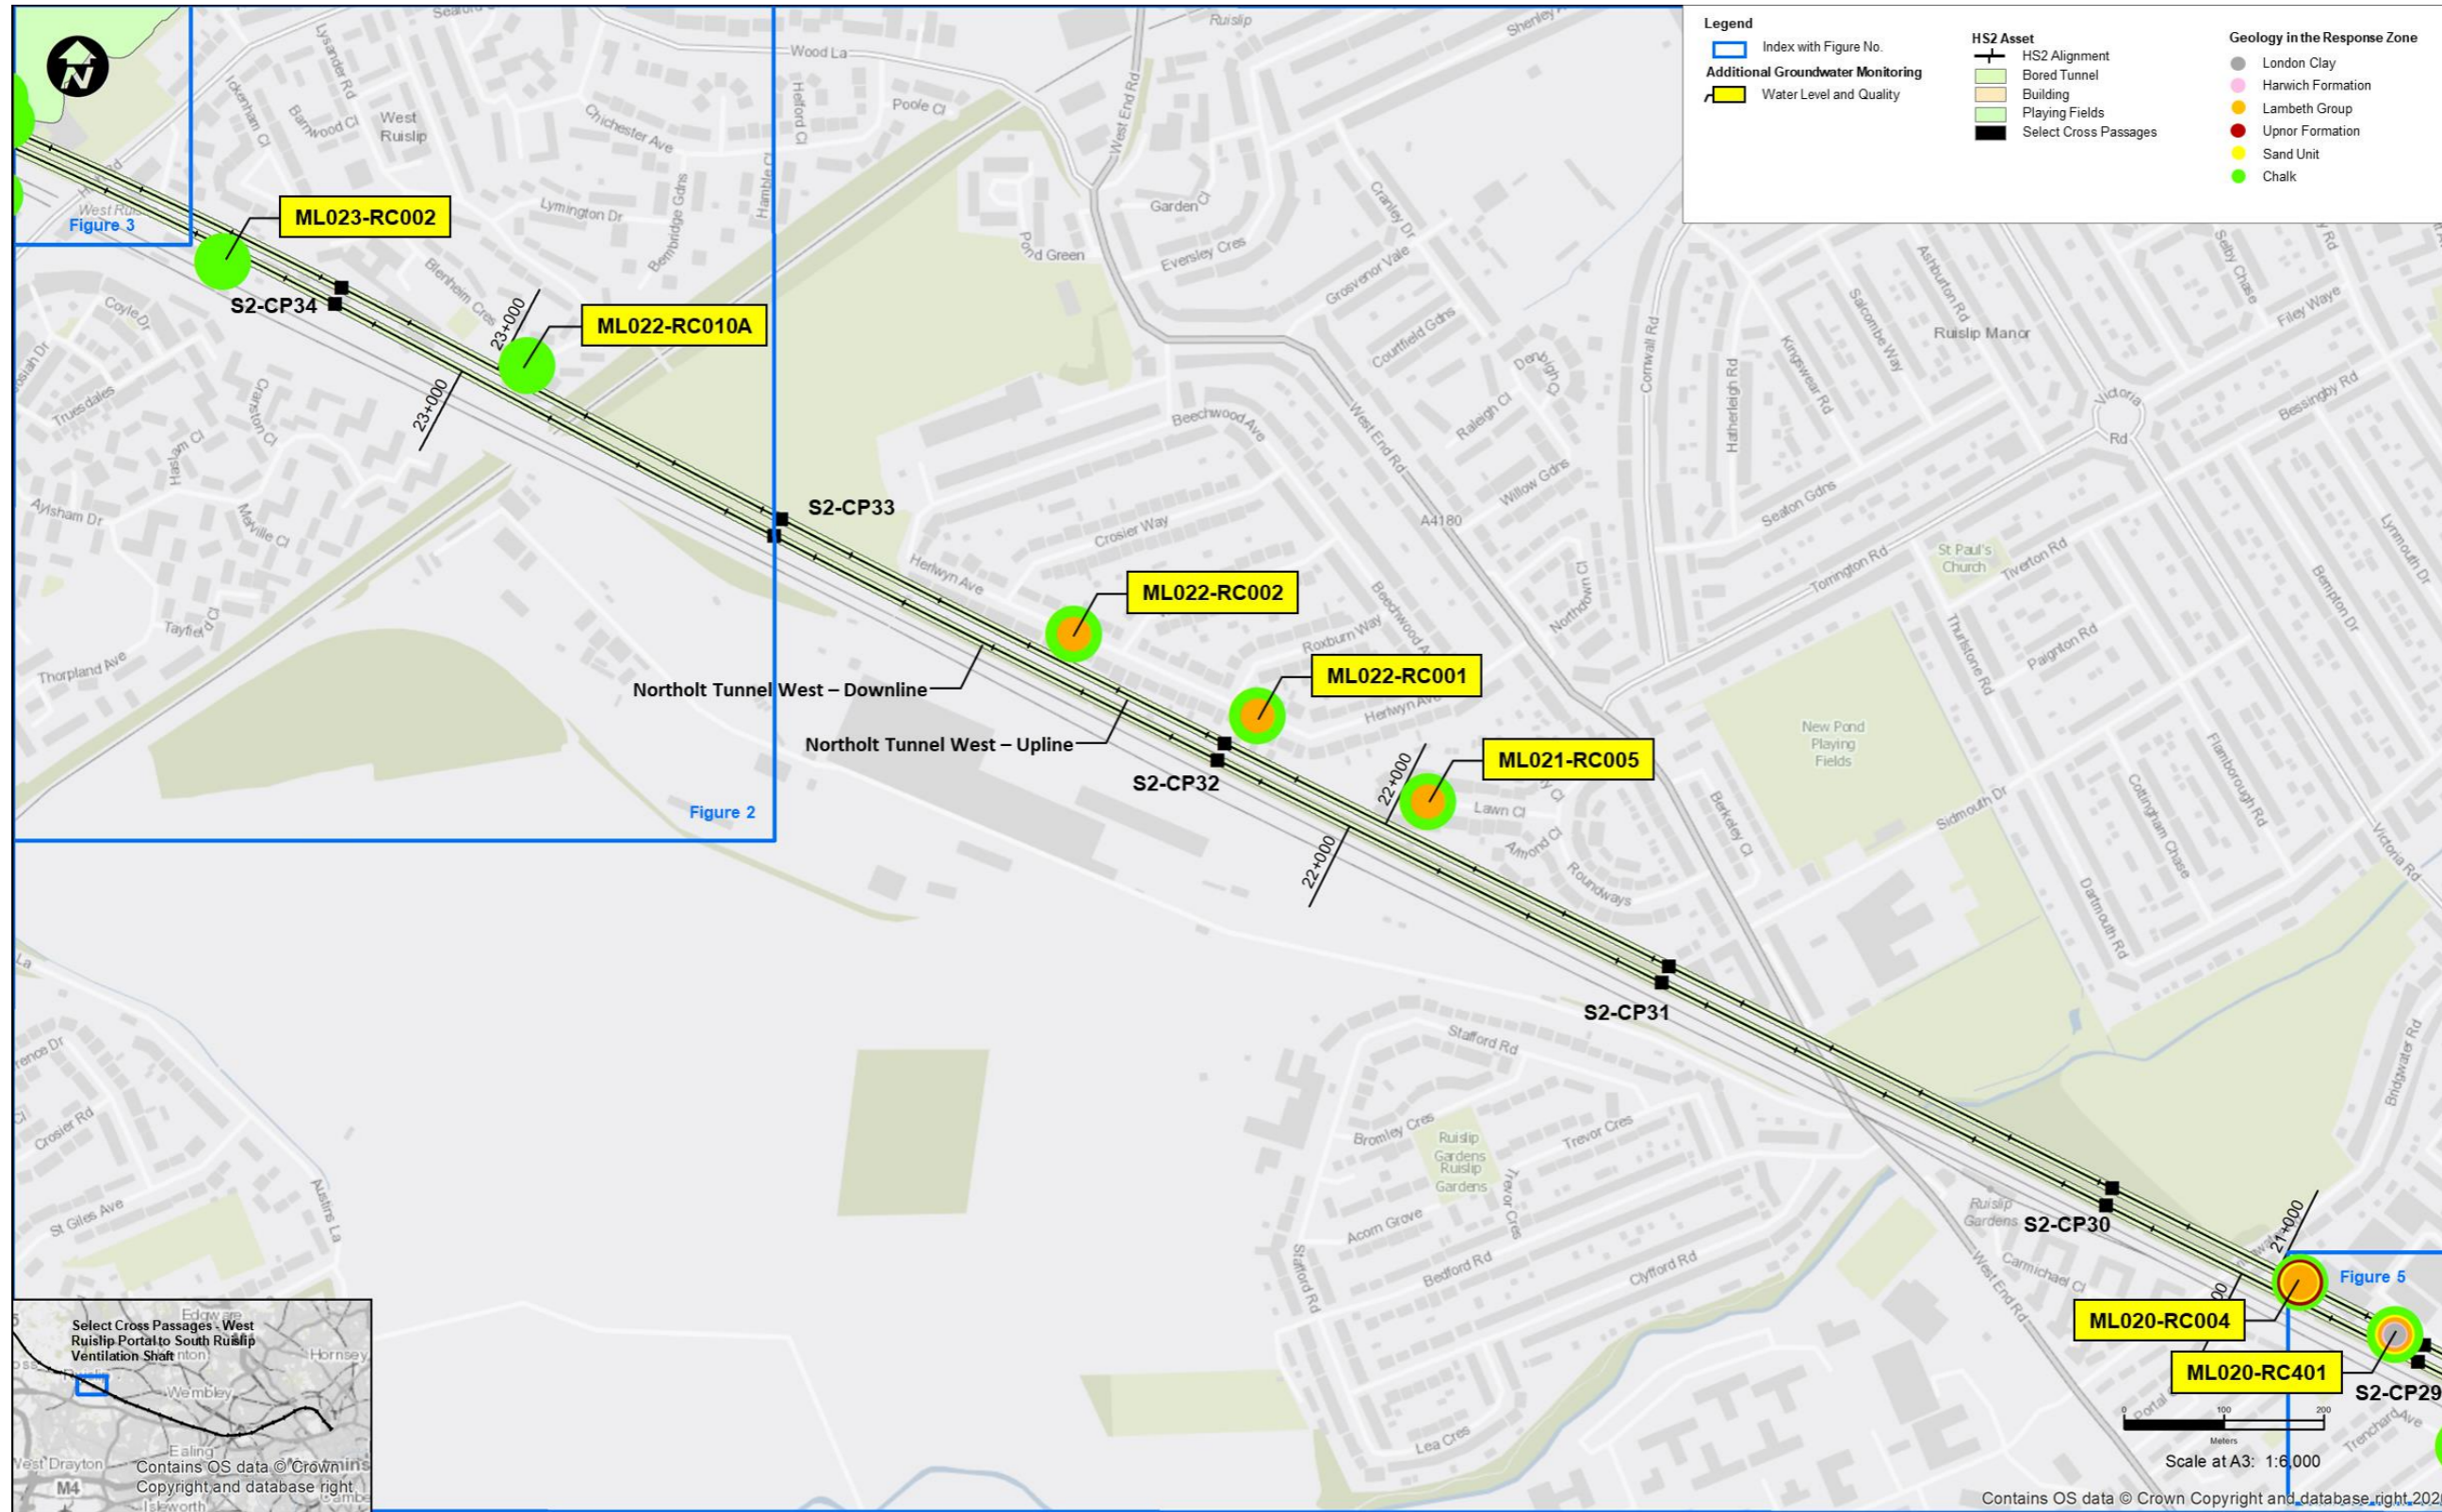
Groundwater Monitoring Plan – Cross Passages and Tunnels – West Ruislip Portal to South Ruislip Ventilation Shaft
